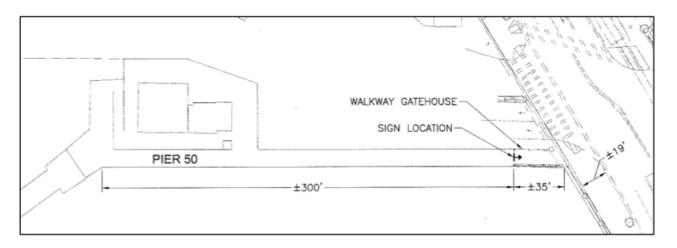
Water Taxi Pier 50 dock site map with sign location
